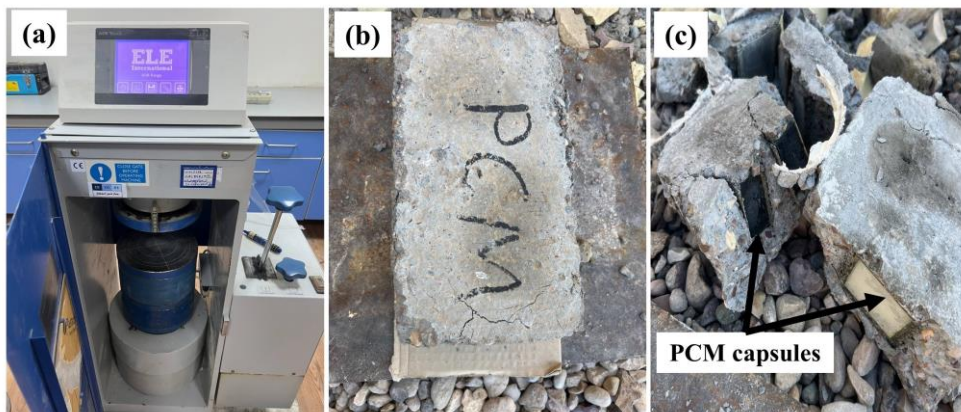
Mechanical test (a) test machine, (b) PCM brick before crushing, (c) crushed PCM brick
